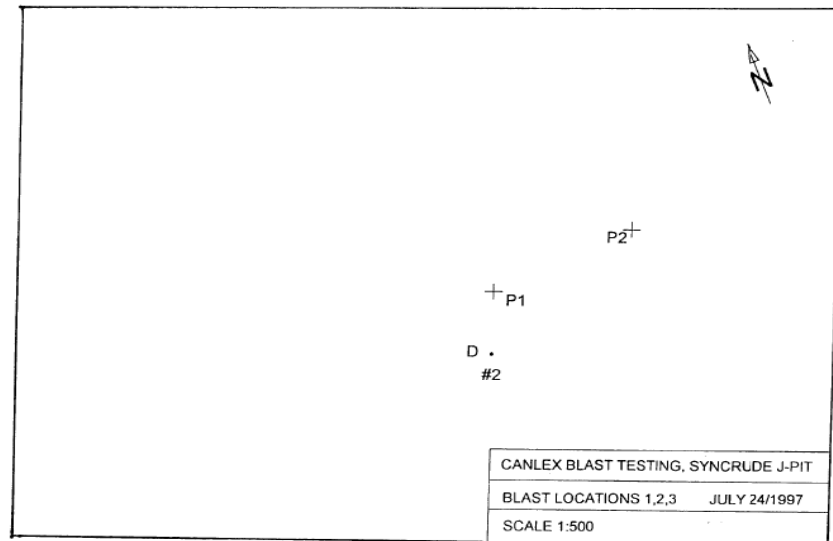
Blasting Layout for CANLEX Blast Testing, Blast #2 ©Pathirage 2000
